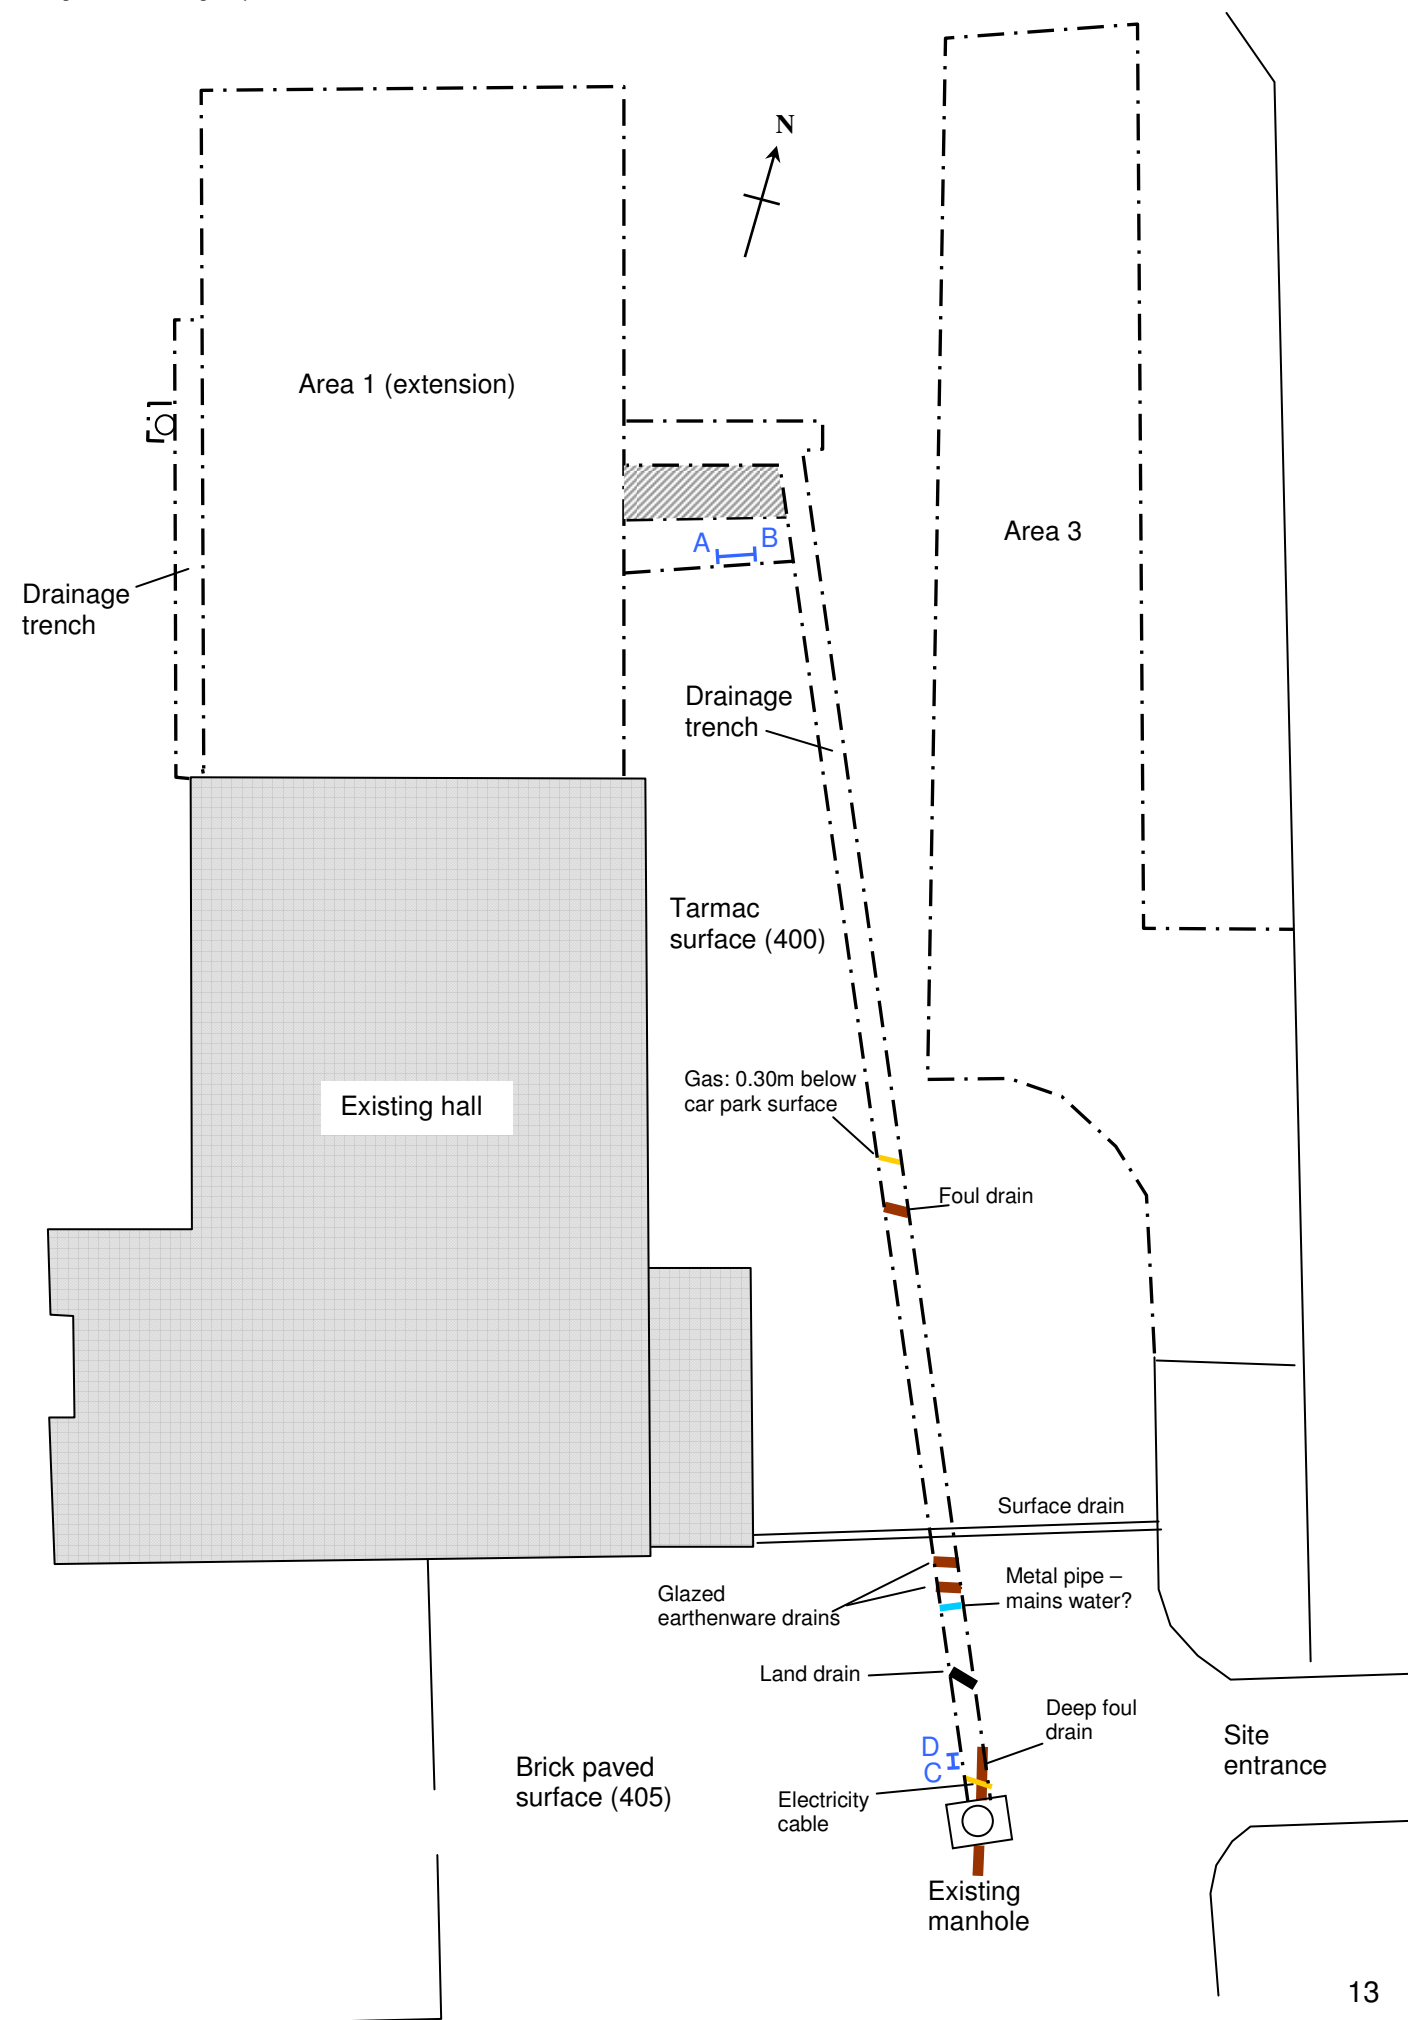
Plan of the drainage trench groundworks recorded as Area 4 at scale 1:200, with two sample sections at 1:20.
